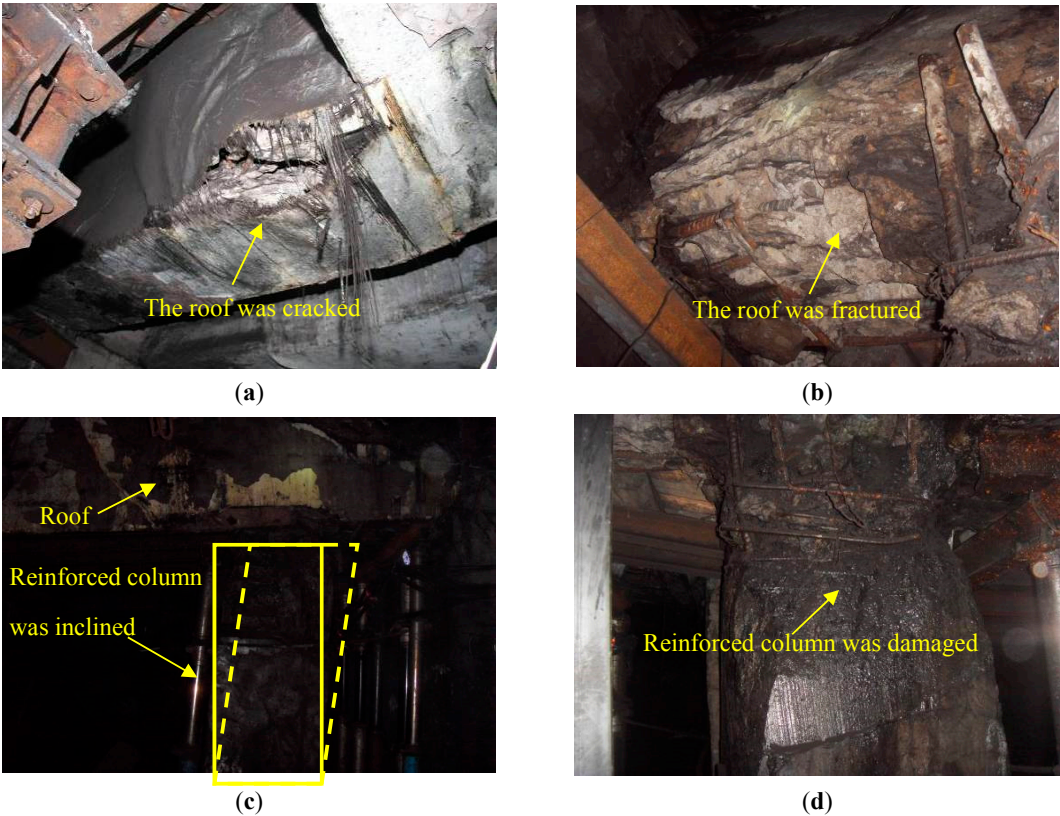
The collapse characteristics of the CGC: (a) the roof was cracked; (b) the roof was fractured; (c) the reinforced concrete column was inclined; (d) the reinforced concrete column was damaged.
